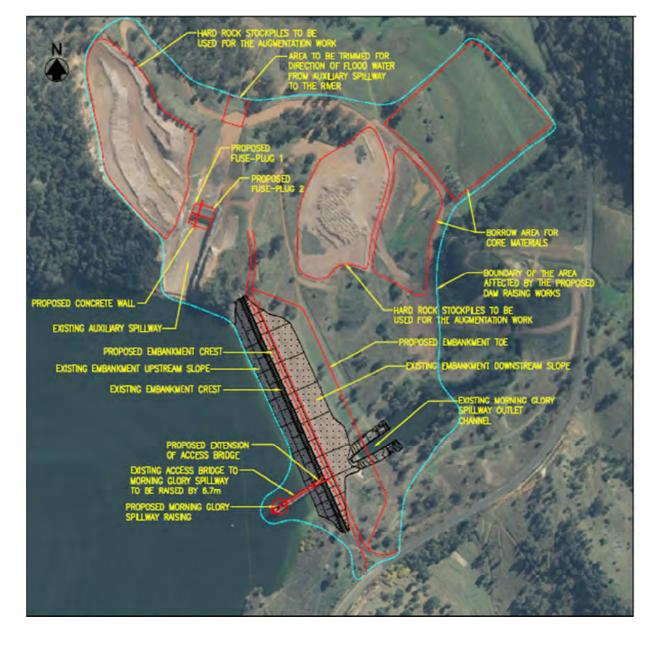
Chaffey Dam Augmentation and Safety Upgrade – Site Layout
